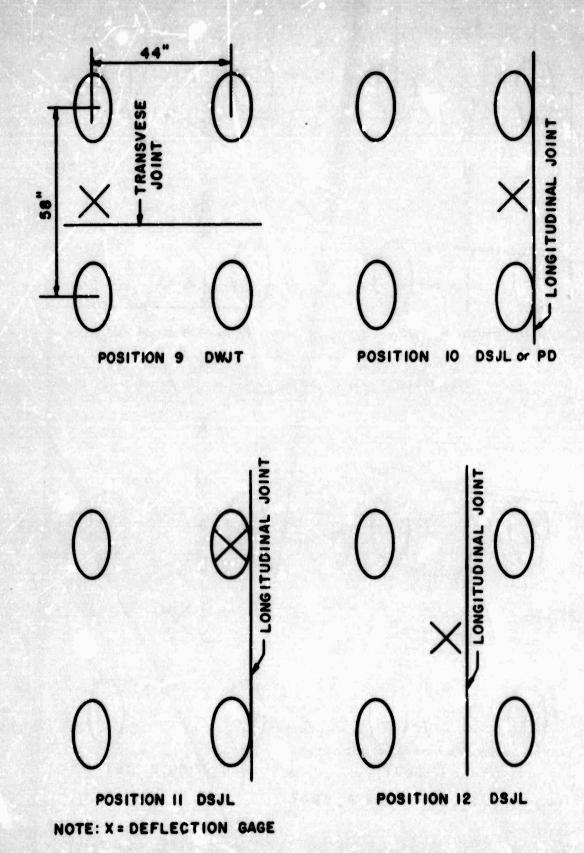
Wheel Positions 9-12 for Twin-Tandem Static Load Tests, Rigid Pavement Test Section
